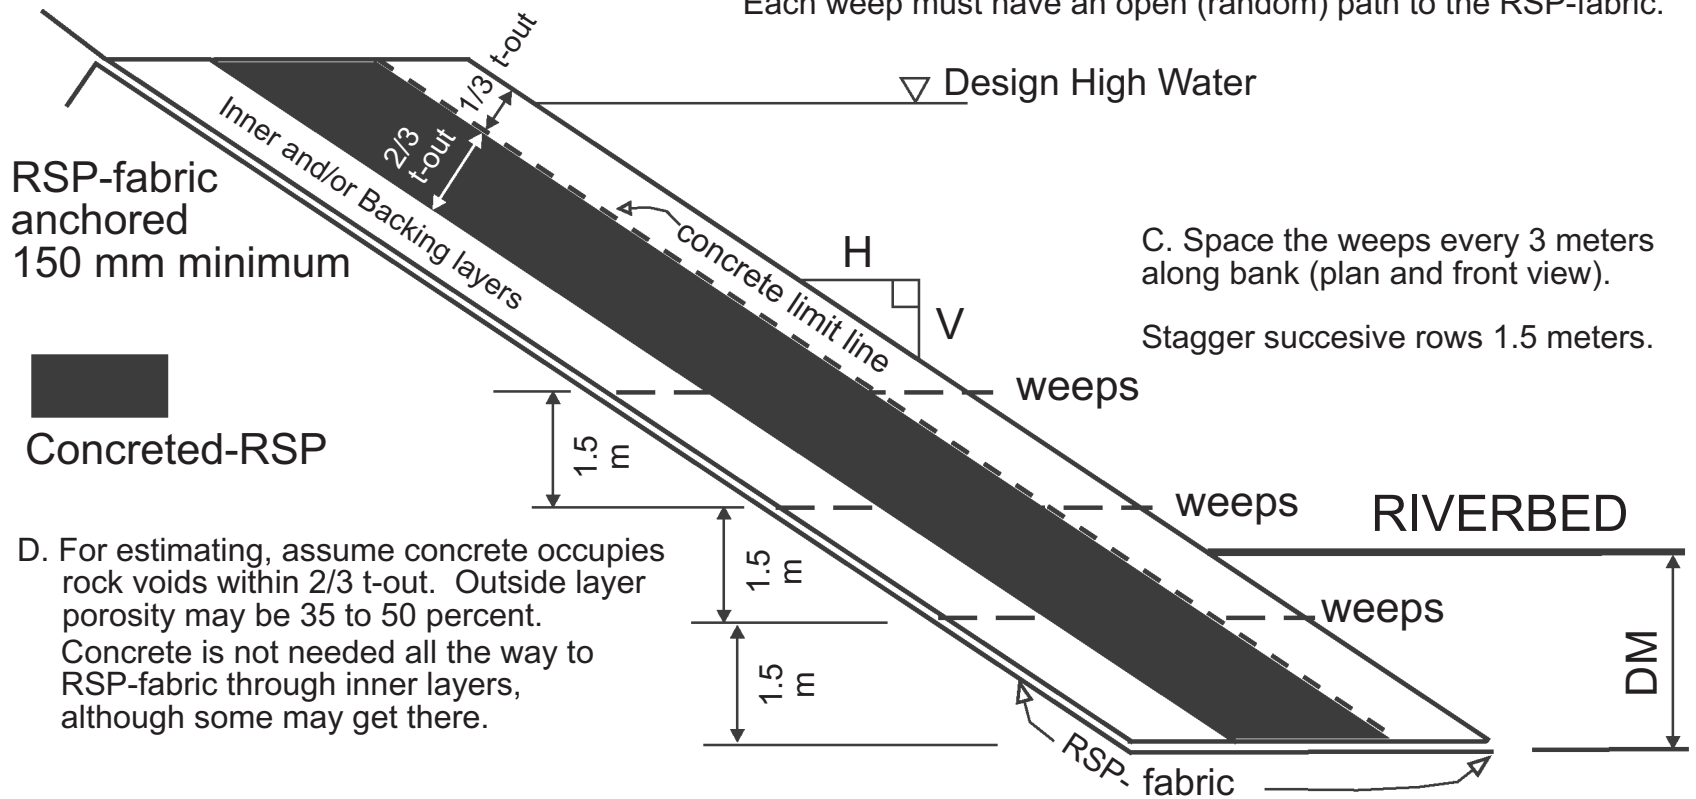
CONCRETED-RSP Design Notes and Construction Details.
